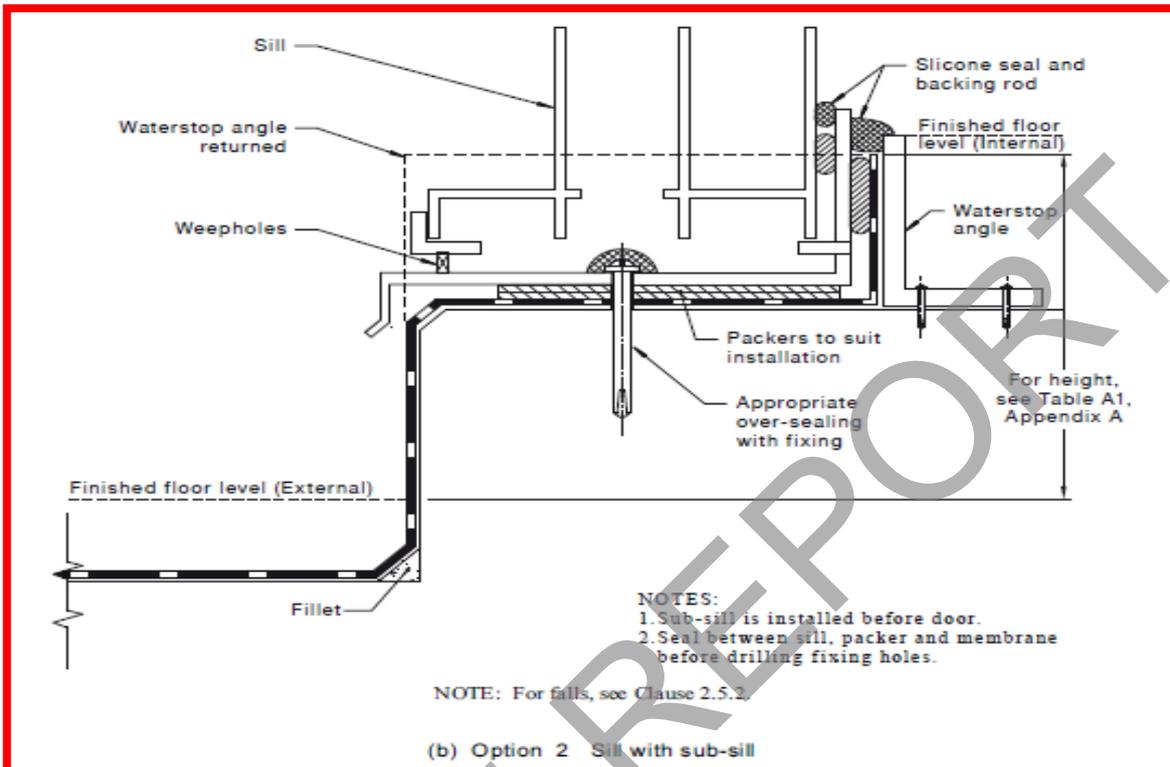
Figure 2.8 (in part) Typical Details Of Membrane Termination At External Opening Doors.
